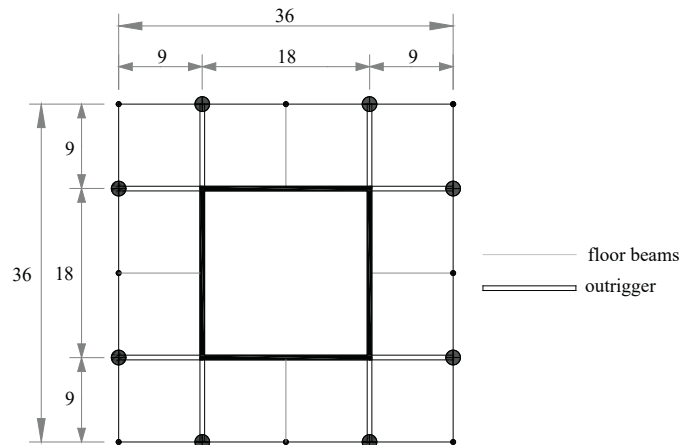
36m square building plan, based on a 9m grid. Note that the outriggers are not loading all the perimeter columns.
